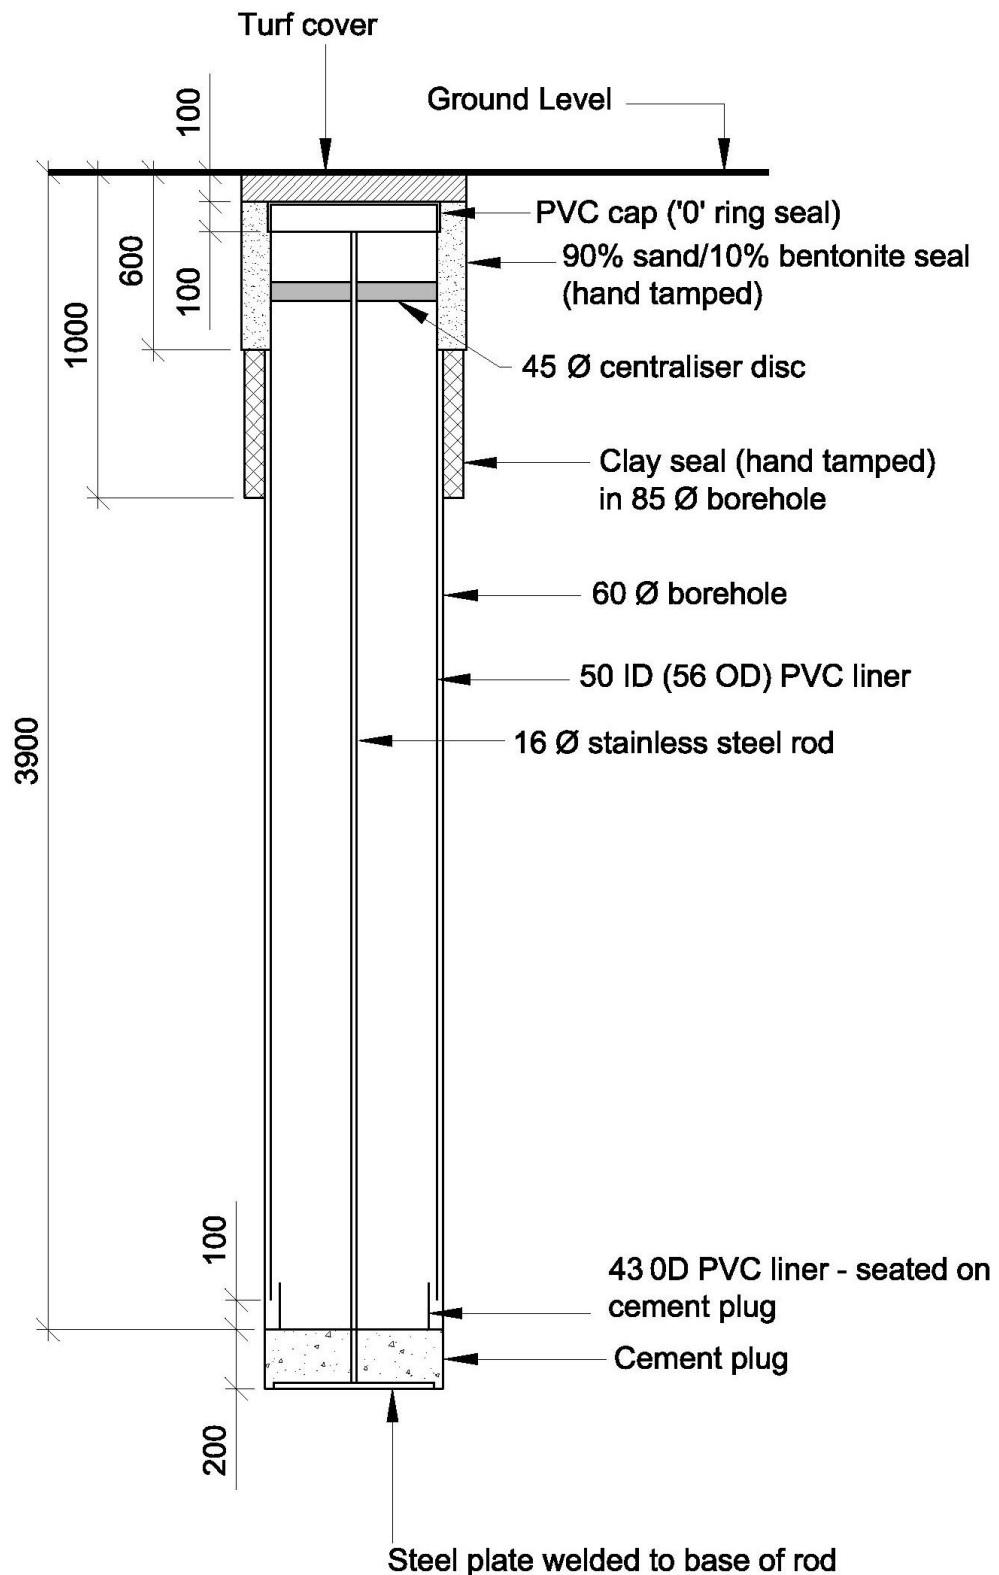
Sketch detail of extensometer construction (4 m deep rod used for example)
